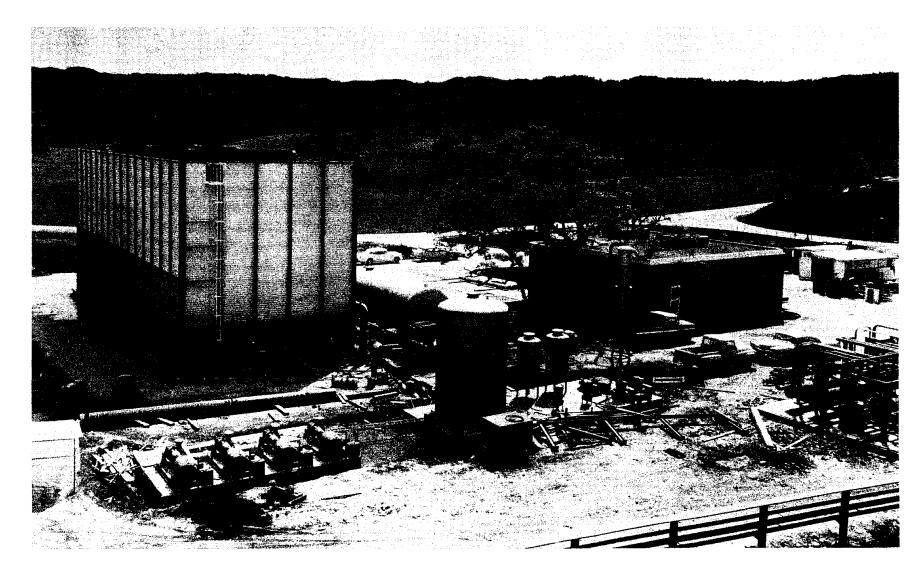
Research area cooling tower and Beam Switchyard electrical substation.
